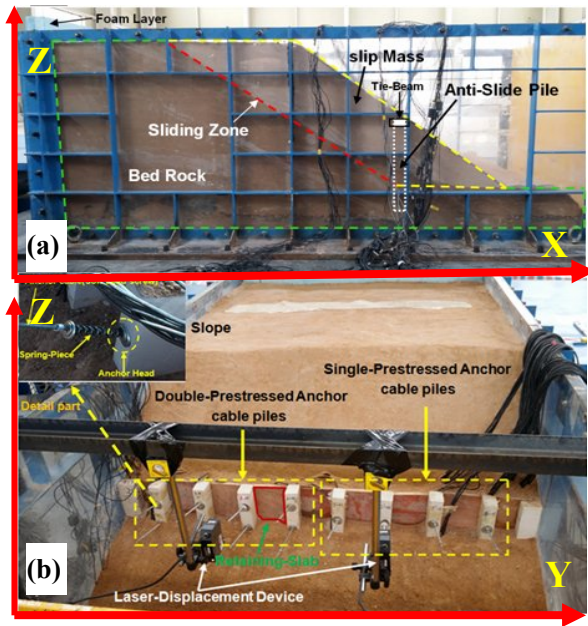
installation of slope with stabilizing structures model before shaking (a) cross-section scheme of constrained anti-slide piles model (b) planar scheme of prestressed anchor slab-pile wall
